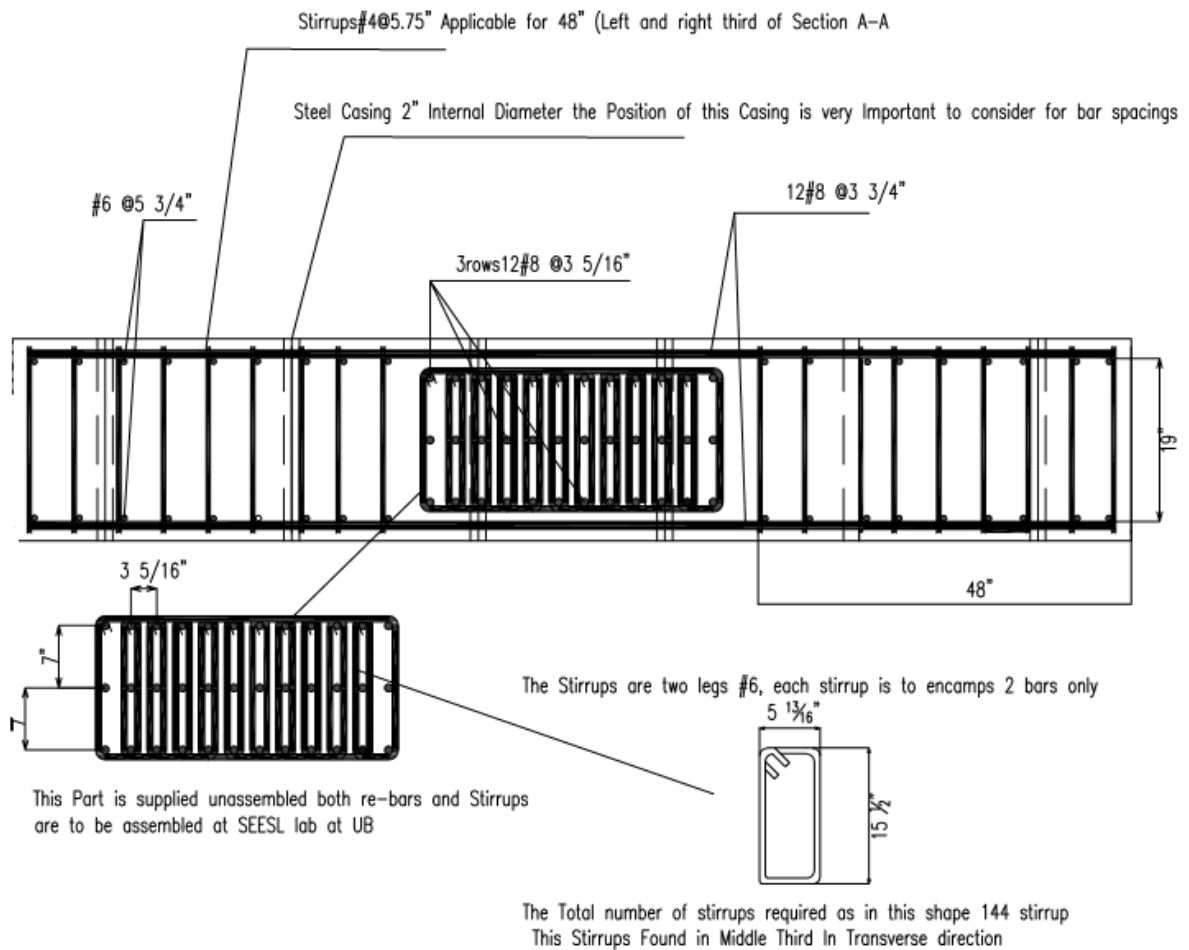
Reinforced Bars and Stirrups Transferring Load from Wall Web
